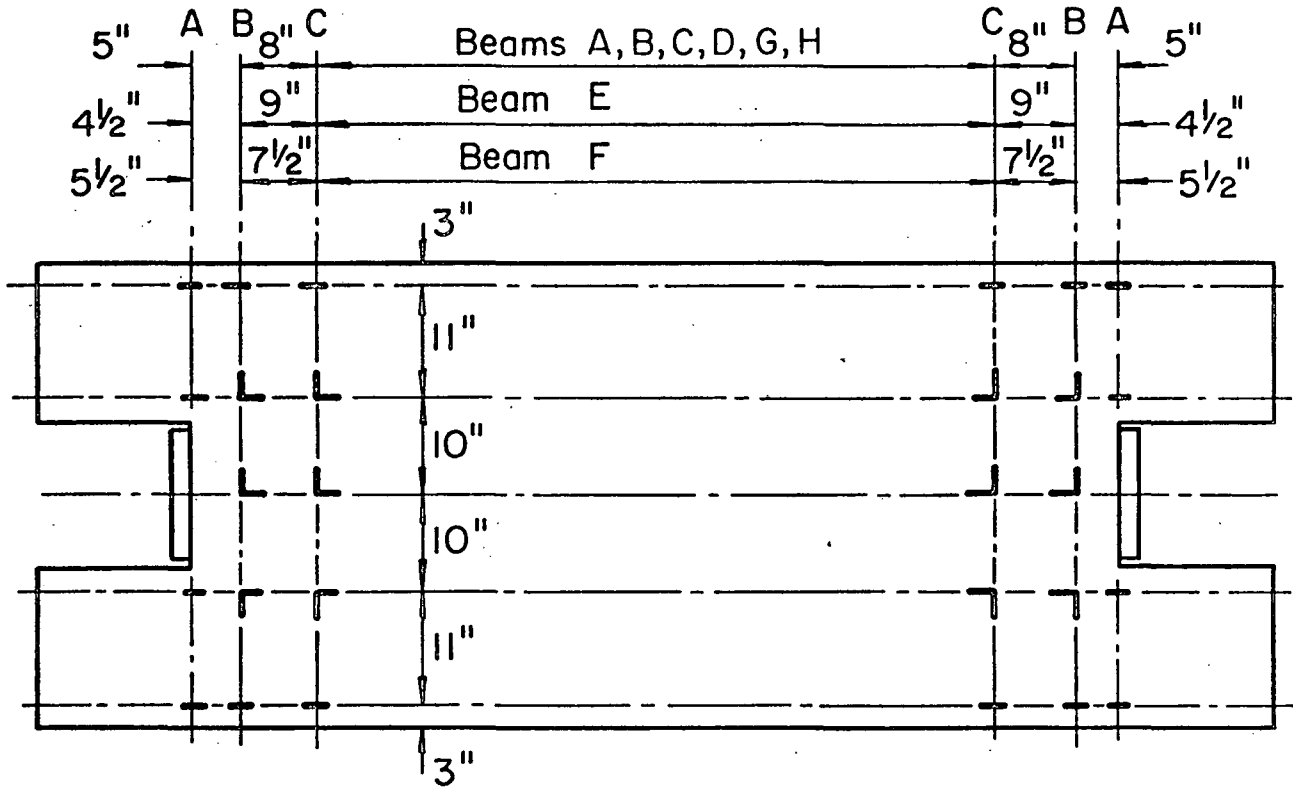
LOCATION OF ELECTRICAL RESISTANCE STRAIN GAGES ON CONCRETE SLAB
